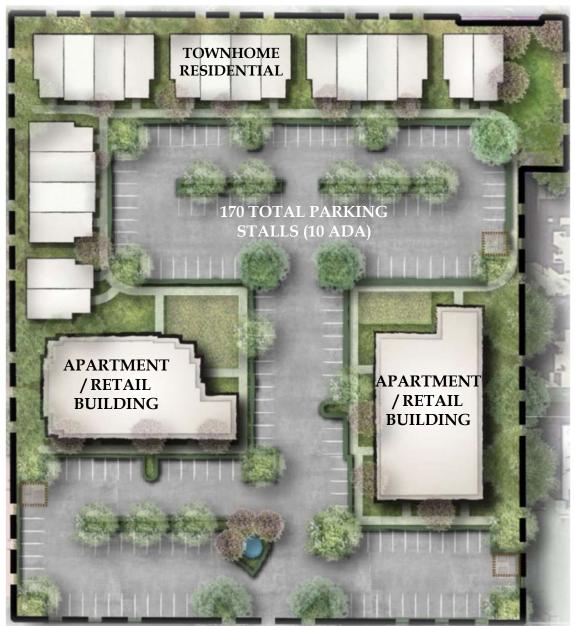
New Mixed-Use Redevelopment Conceptual Site Plan
